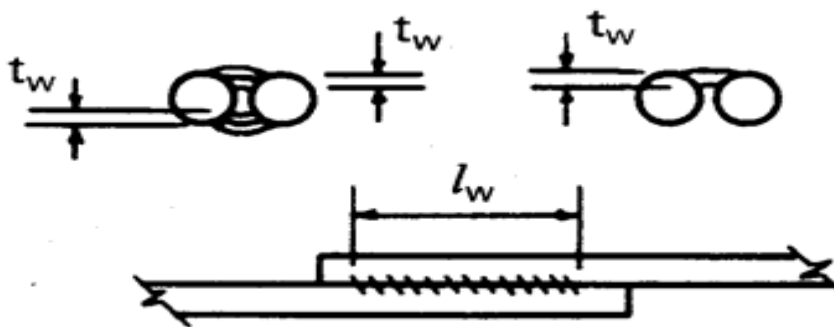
Welded splice reinforcement bar [34]
